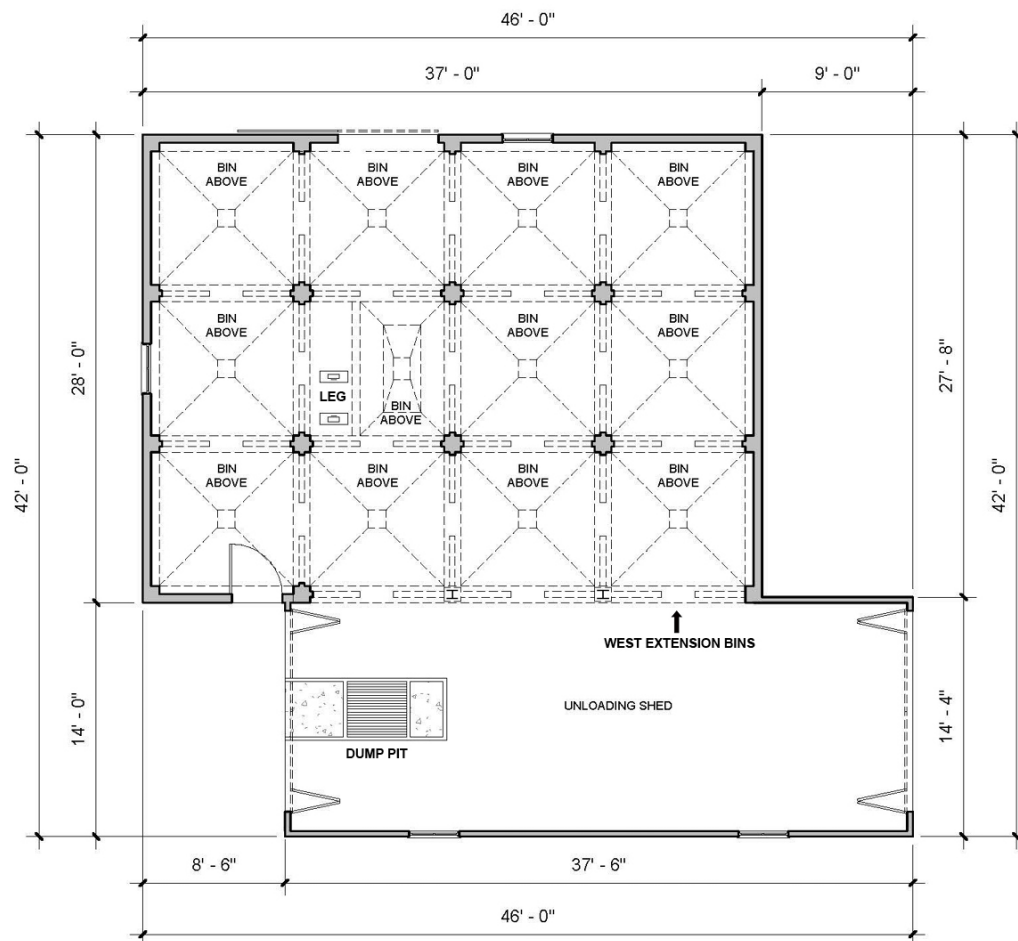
Floor Plan. Pathfinder CRM, LLC 2022
